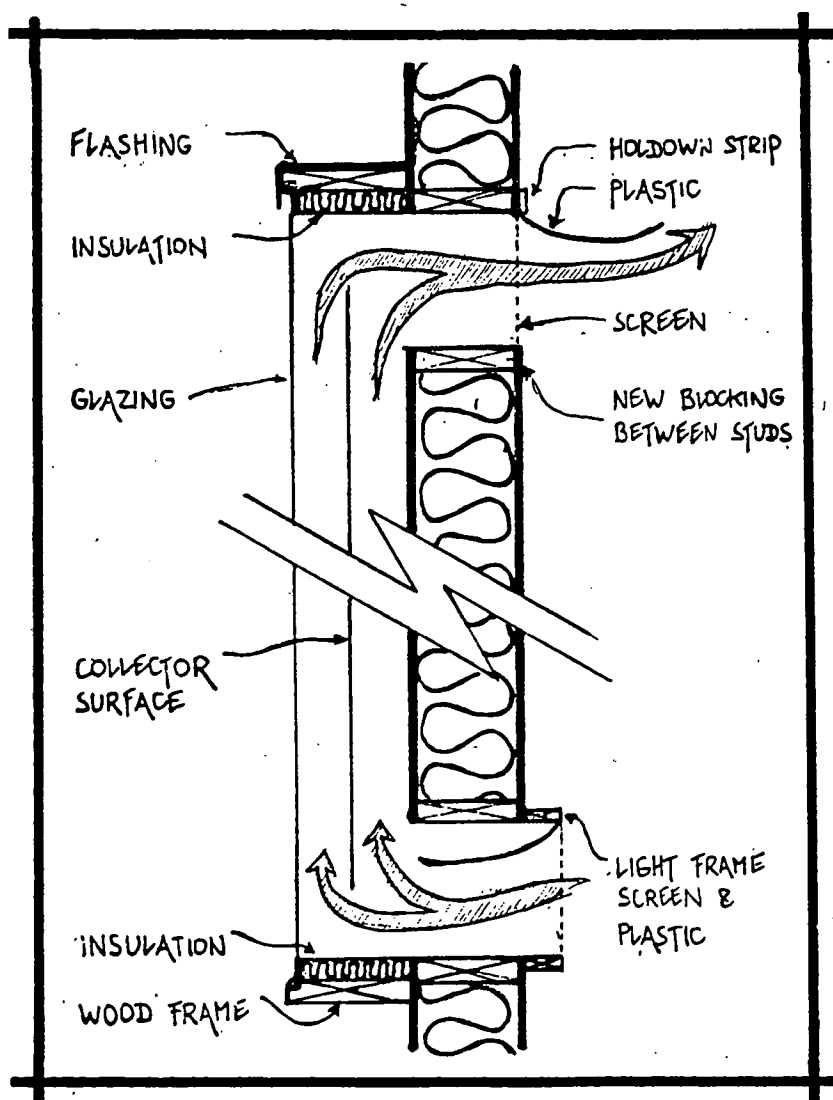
Simplified construction detail of a convective loop collector to an existing timber wall.
